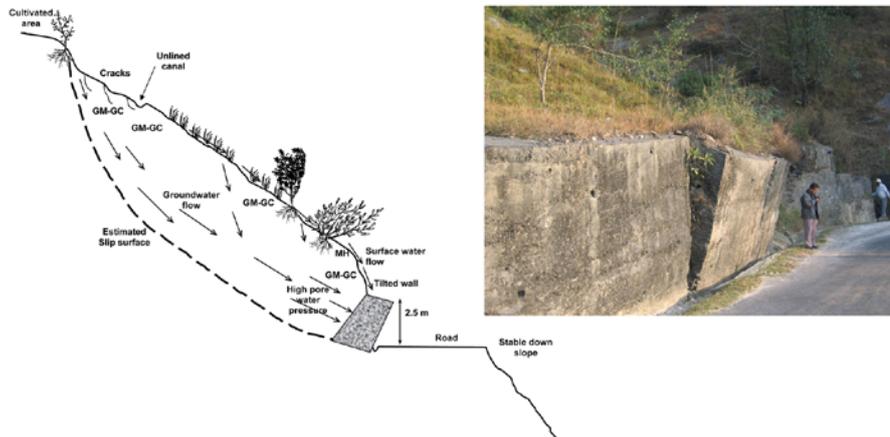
Schematic diagram of Kattike Mool landslide and damage concrete masonry wall at km 1+200, Sidhartha Highway, Pumdi Vumi, Pokhara, Kaski
